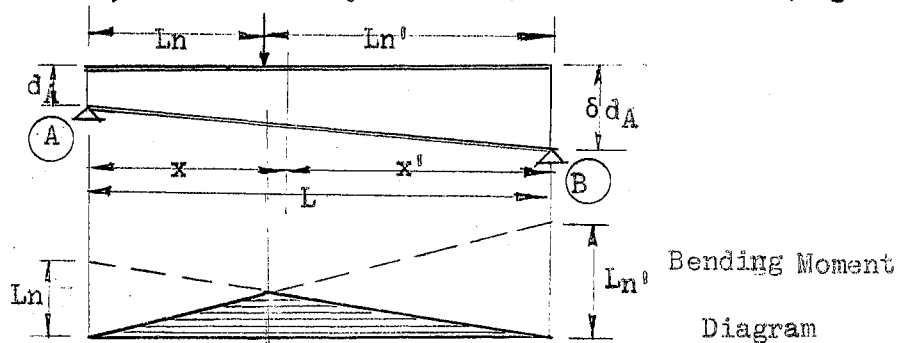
A Tapered Beam of I-Section, Box Section or T-Section Concentrated Load
